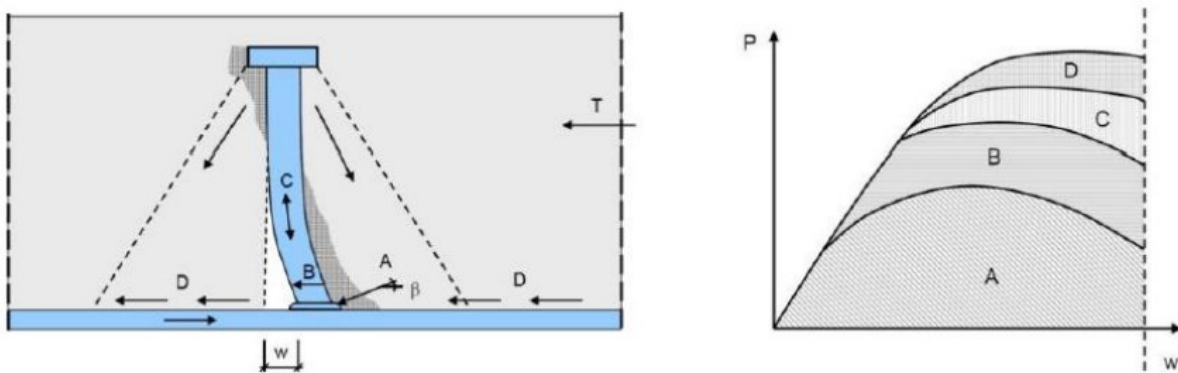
Load transfer mechanism of headed shear stud connector in concrete slab [4])
